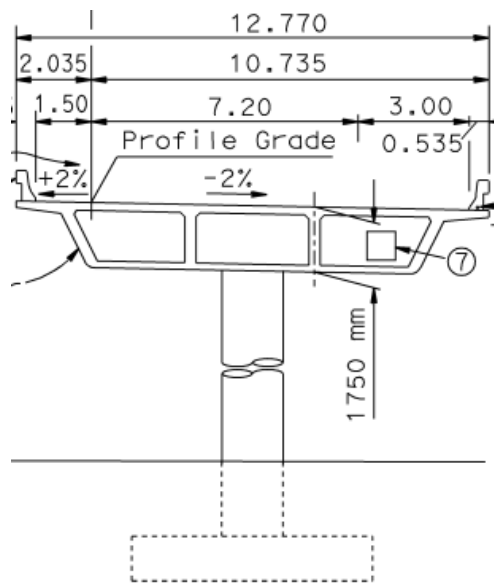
Cross-Section detail of R14R bridge deck (Caltrans)
